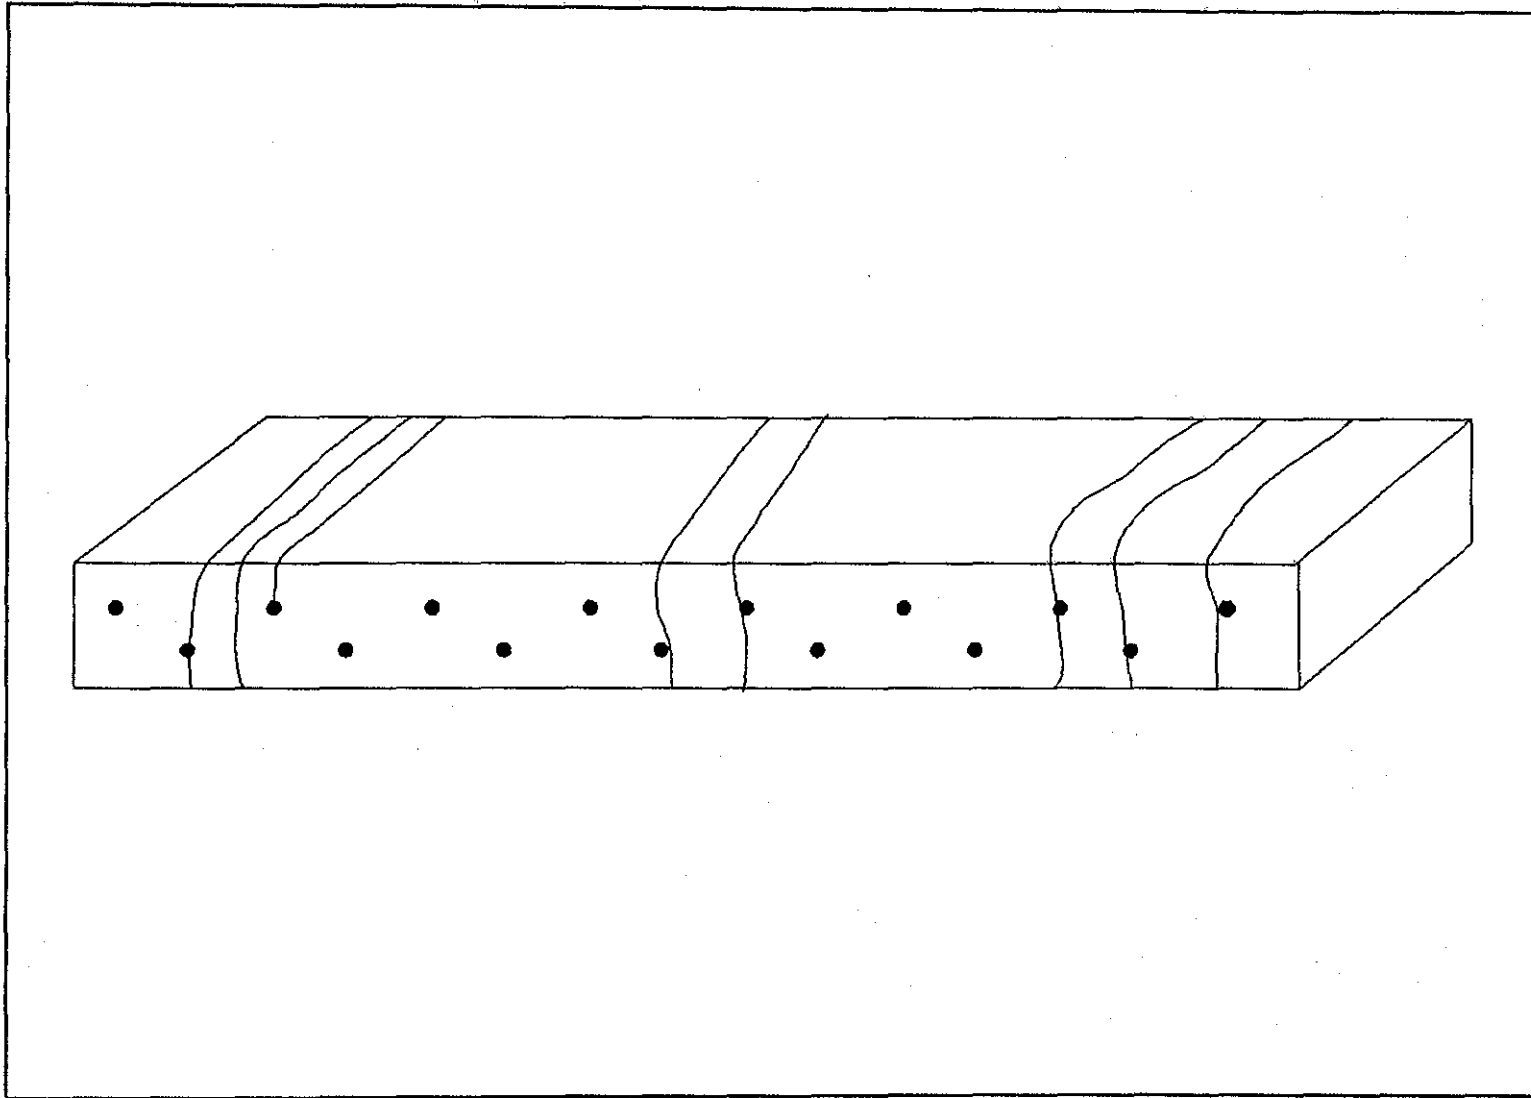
Cracks Initiated from the Transverse Steel Rebars.
